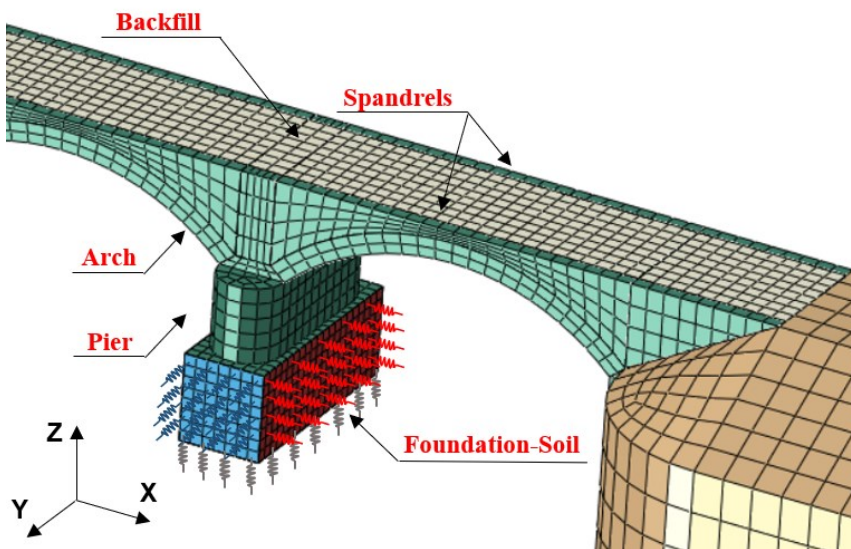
Finite element model, Winkler model of the soil-foundation, and global reference system.
